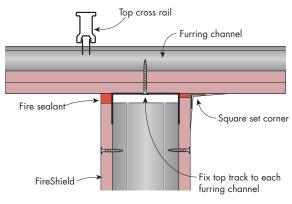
Wall Head to Suspended Ceiling Finishing Detail
